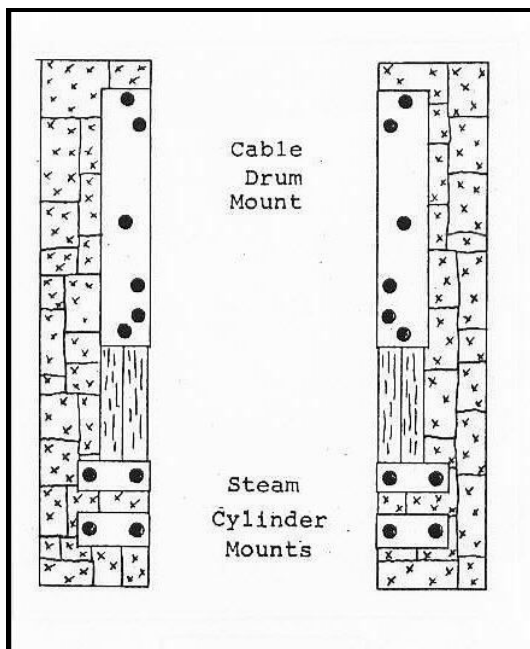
The plan view depicts a typical foundation for a direct-drive single-drum steam hoist. Such foundations are usually less than 14 by 17 feet in area. Source: Eric Twitty.
